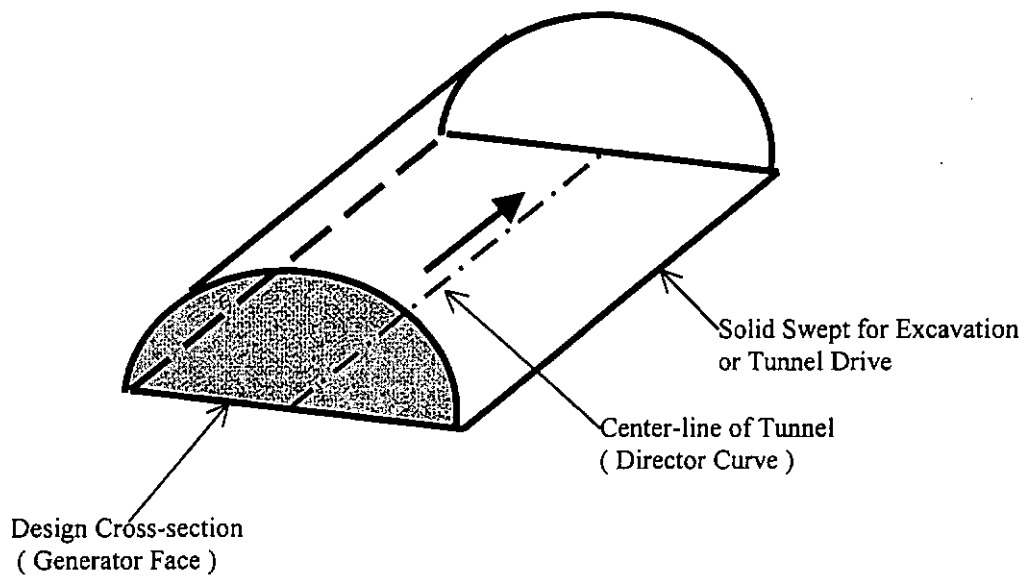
Tunnel generated by translational sweeping of a 2D cross-sectional plane.
